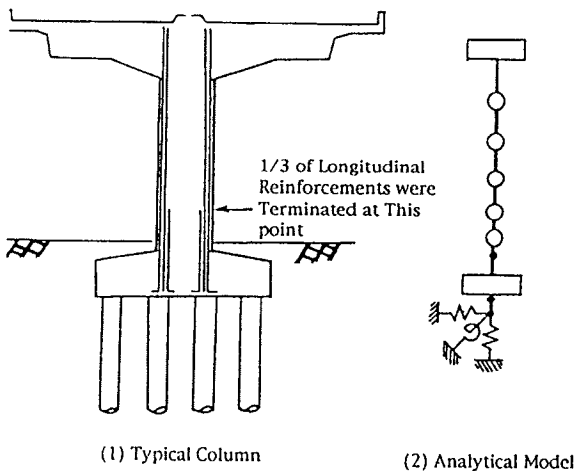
Analytical Model of Pier 138, Fukae Bridges
